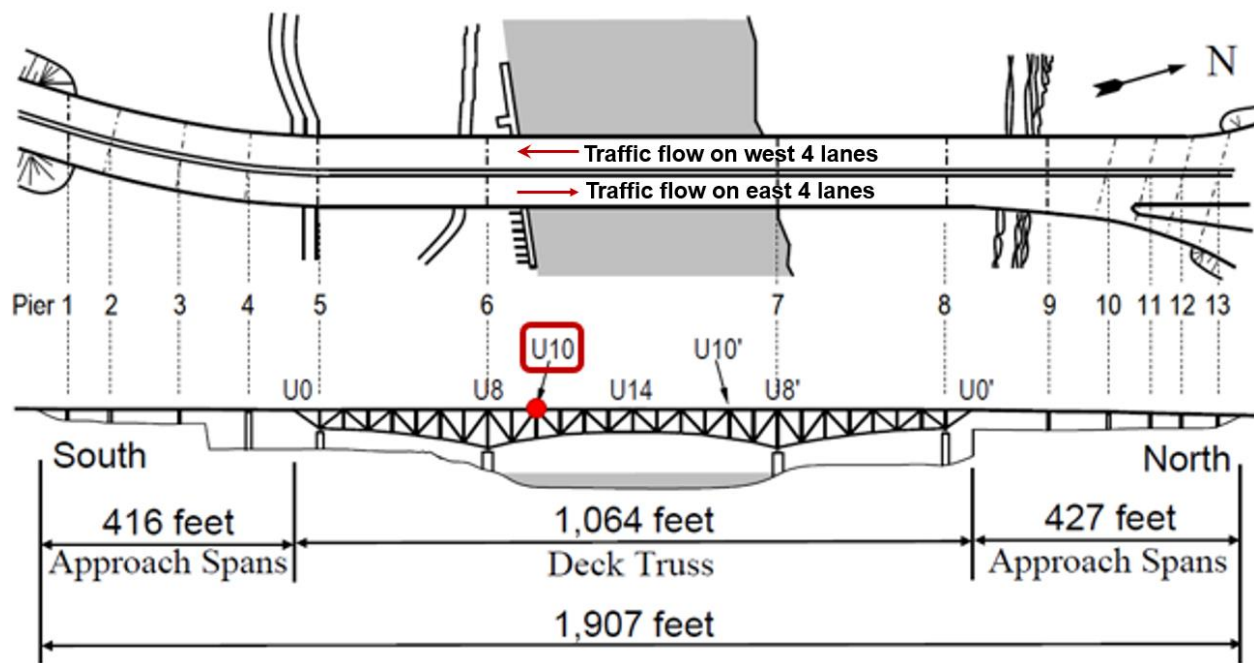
Plan and elevation view of I-35W Bridge. Mn/DOT (2009). I-35W Bridge original plans & details. <http://www.dot.state.mn.us/i35wbridge/history.html>, Minnesota Department of Transportation. Used under fair use, 2015.
